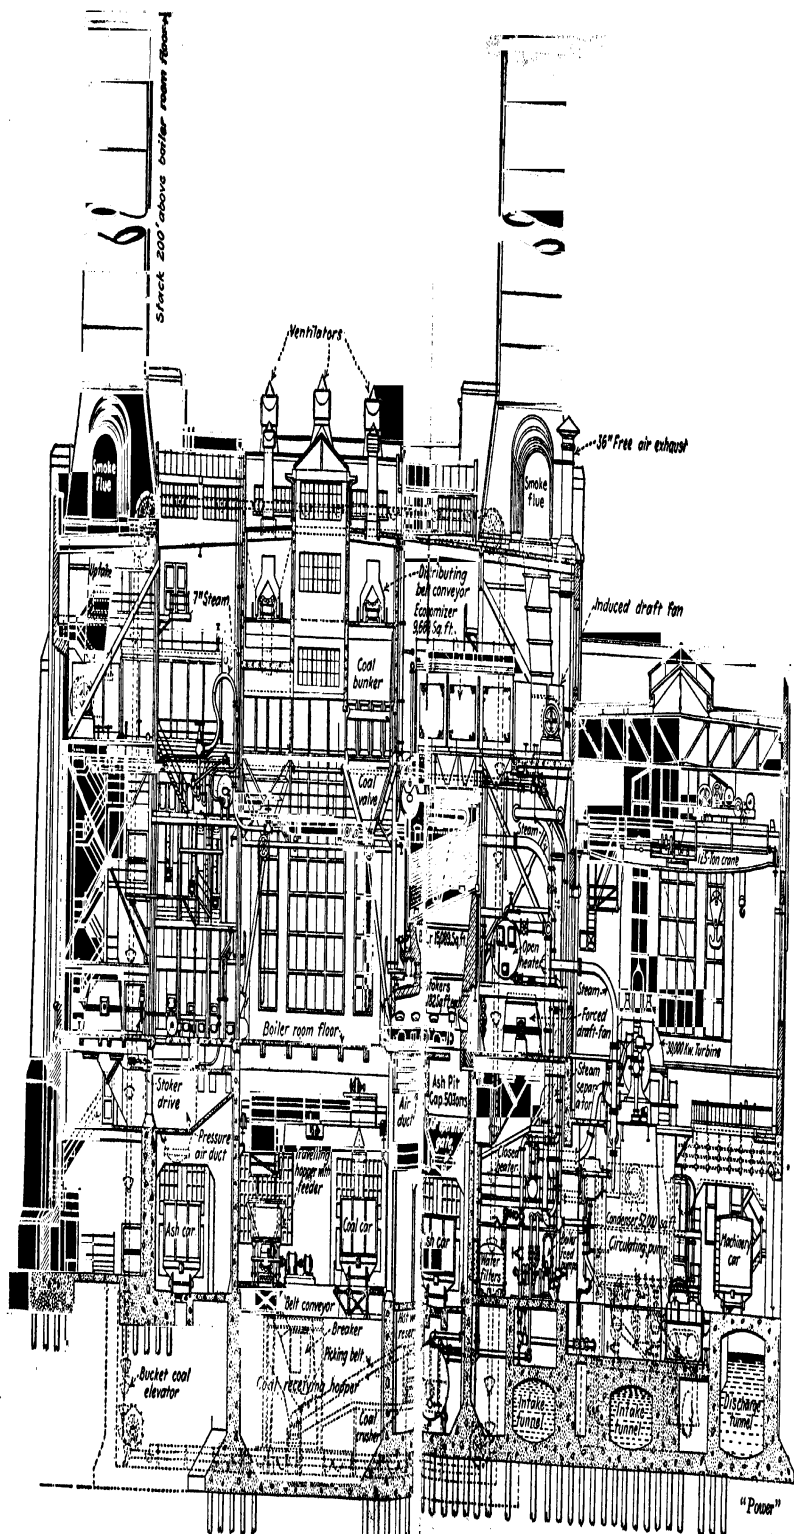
Elevation through Calumet Steam Power Plant showing Arrangement of Equipment — Central Station.
